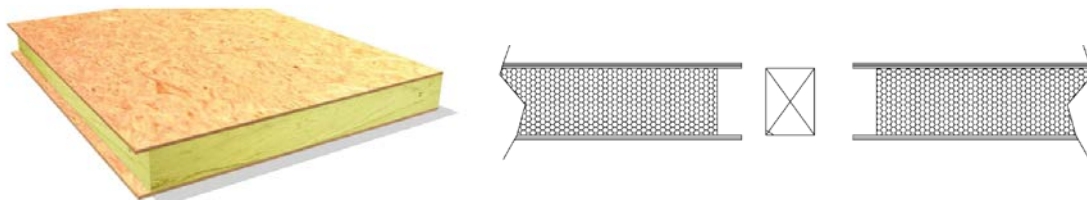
Structurally insulated panel (left), reinforced junction (right)
